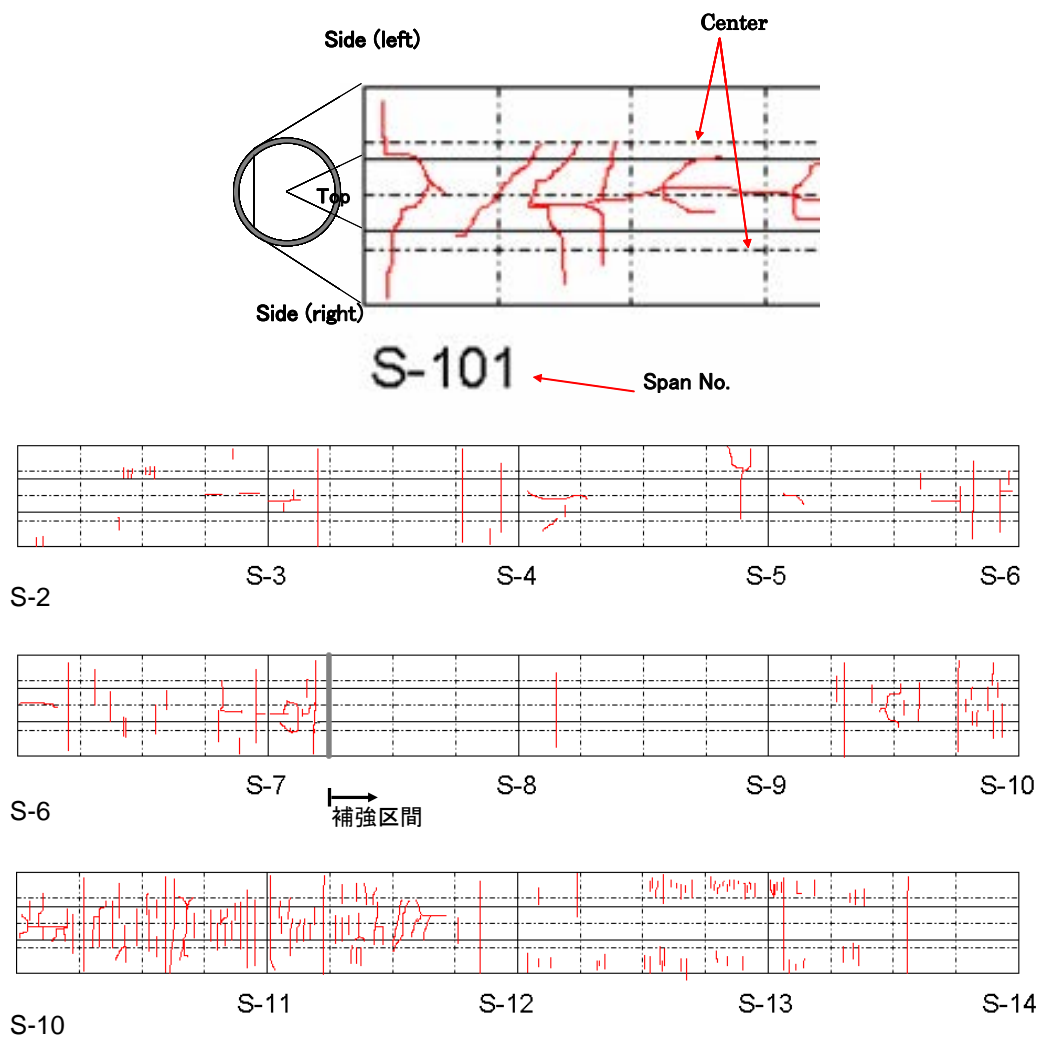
Crack distribution of a concrete tunnel from Span S2 to S14 (Takeuchi and Suzuki, 2007)
